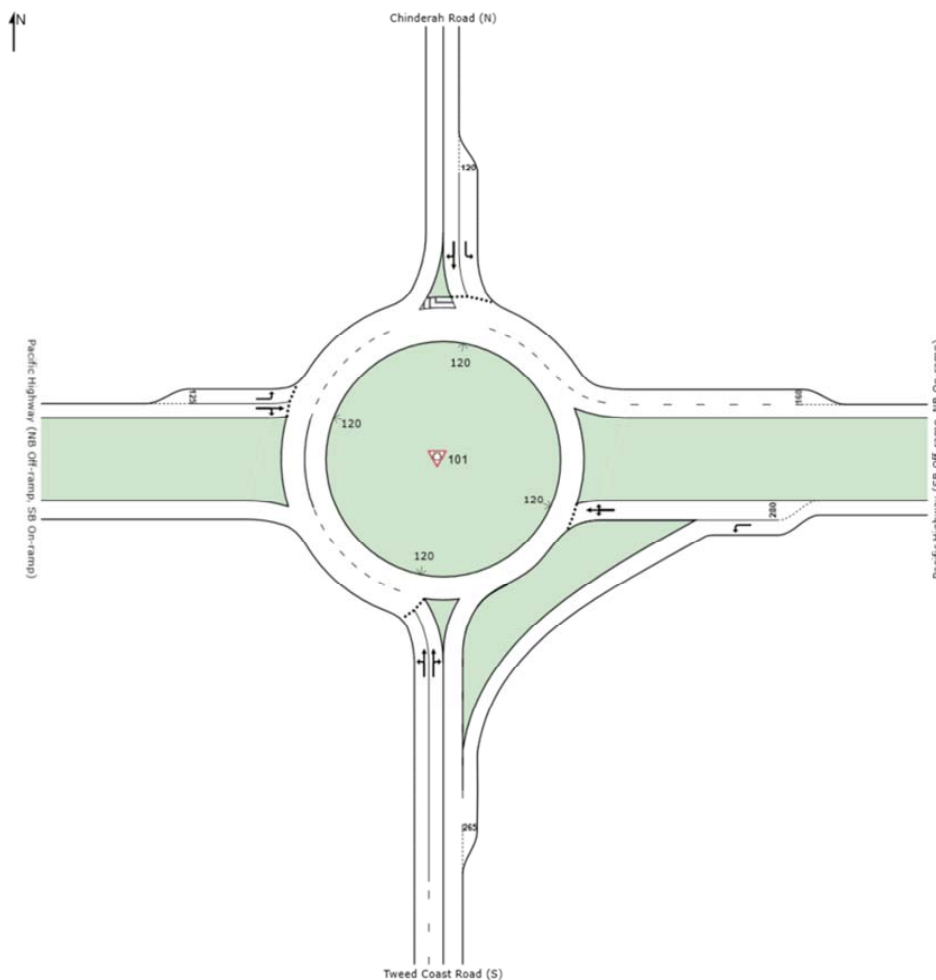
Pacific Highway / Tweed Coast Road SIDRA Intersection Layout
